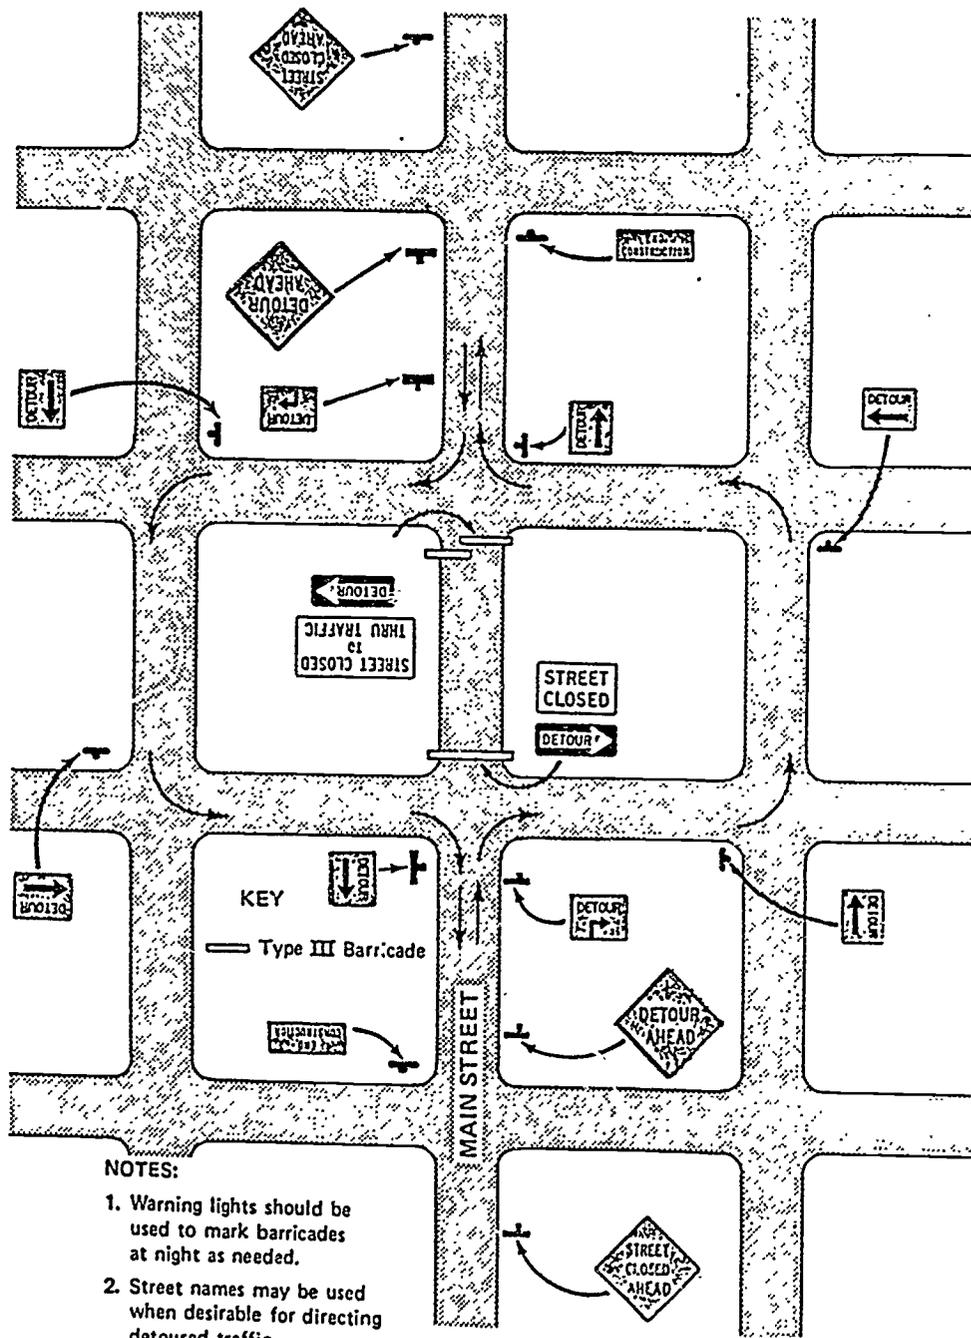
Typical Application—Detour Signing for Street Construction Project in a Street Grid (MUTCD, Figure 6-4)
